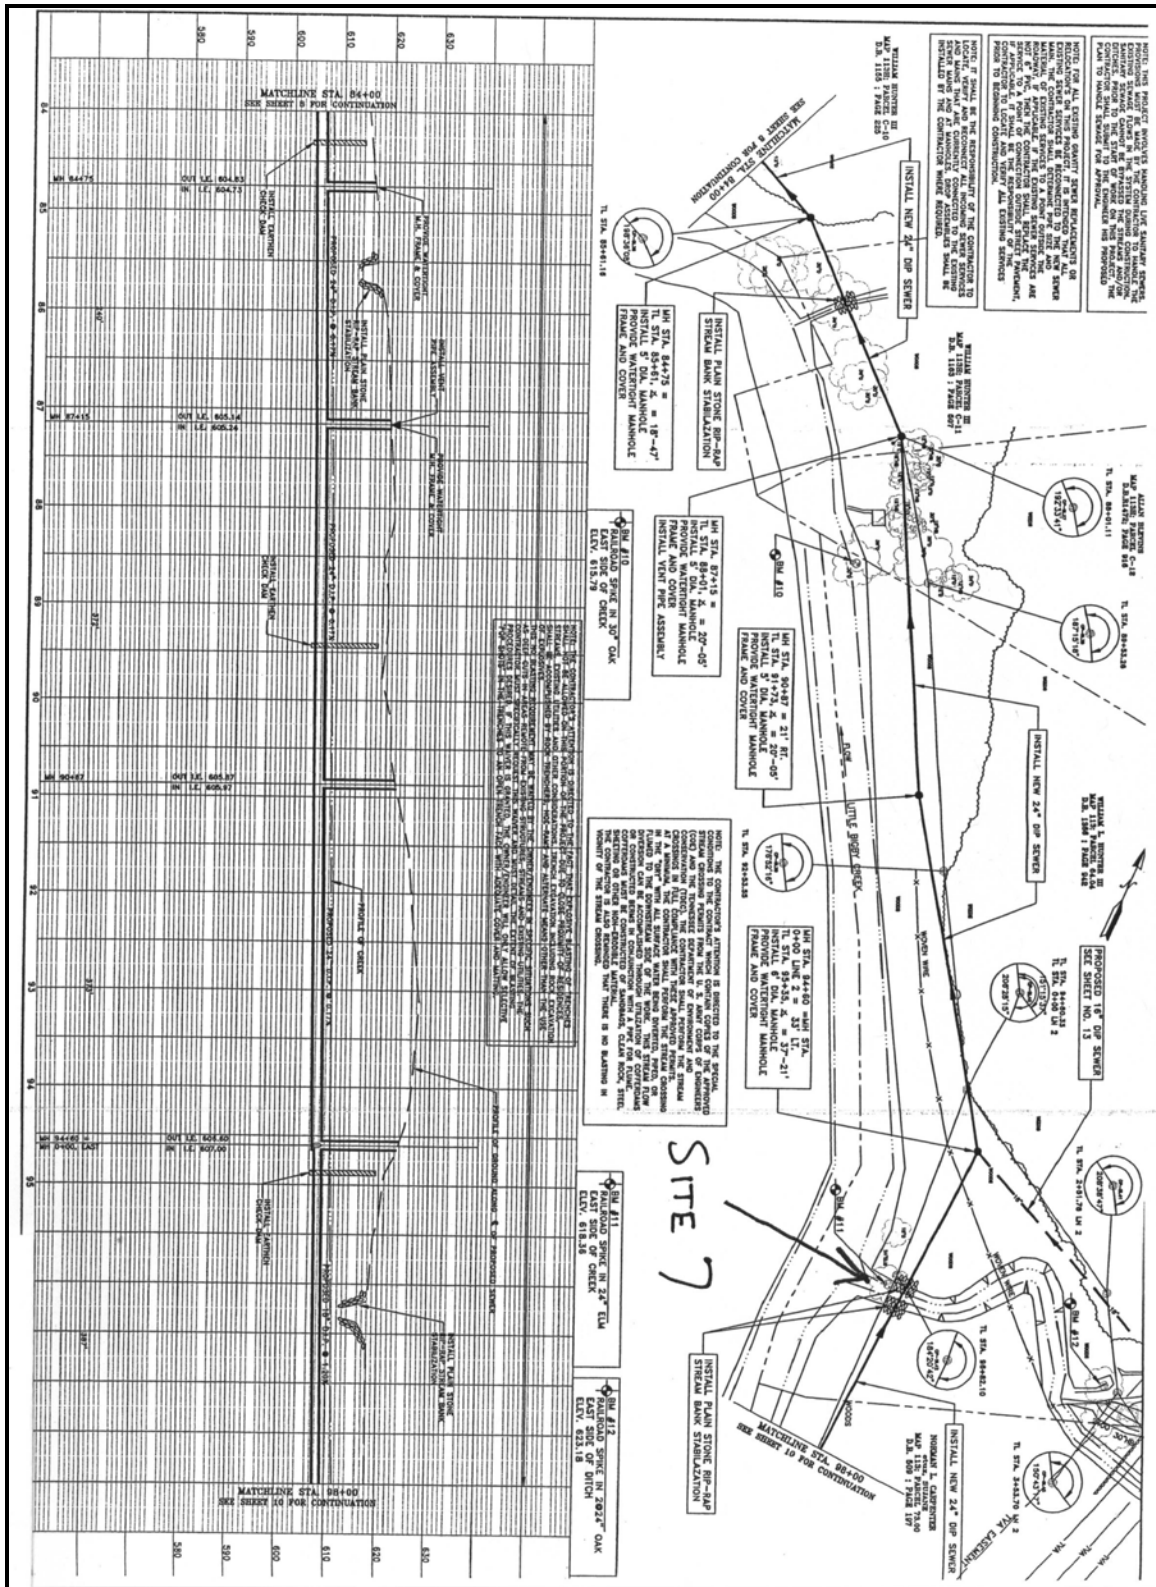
Plan sheet 9, site 7 on Tributary to Little Bigby (1) (new crossing)
